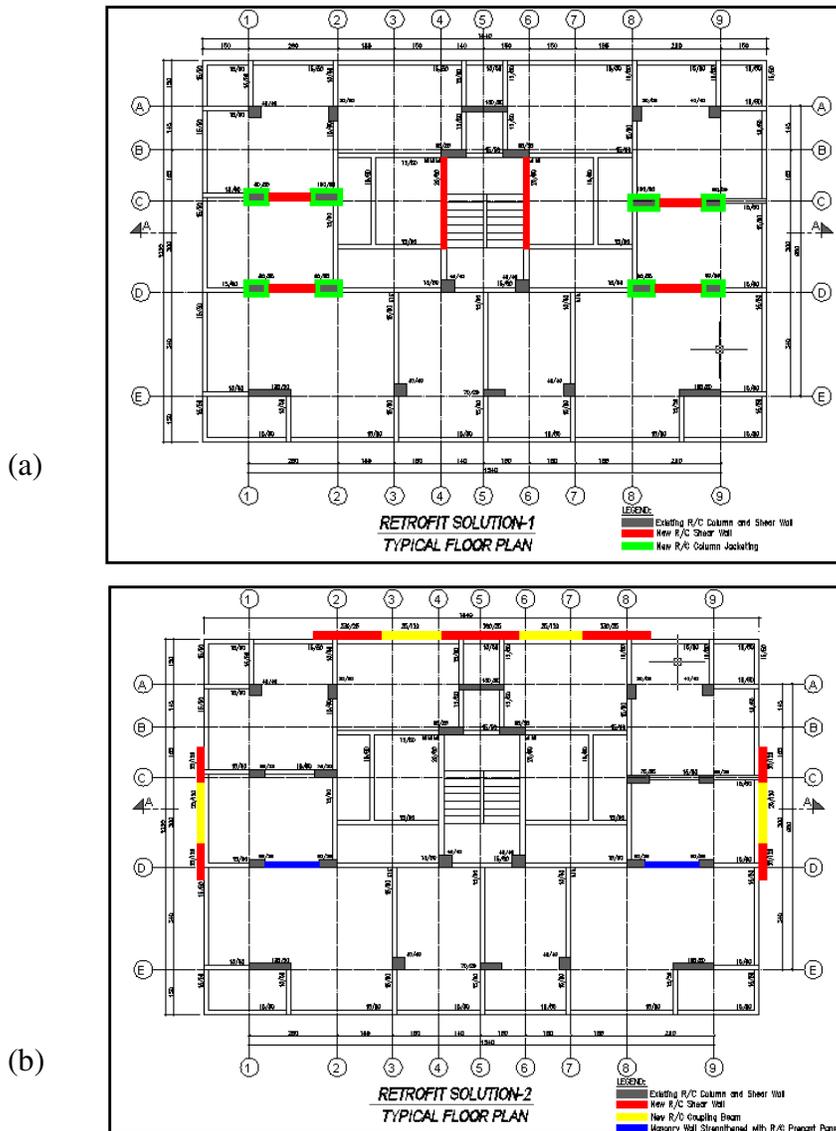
(a) Interior and (b) exterior retrofit solutions for the case study building
